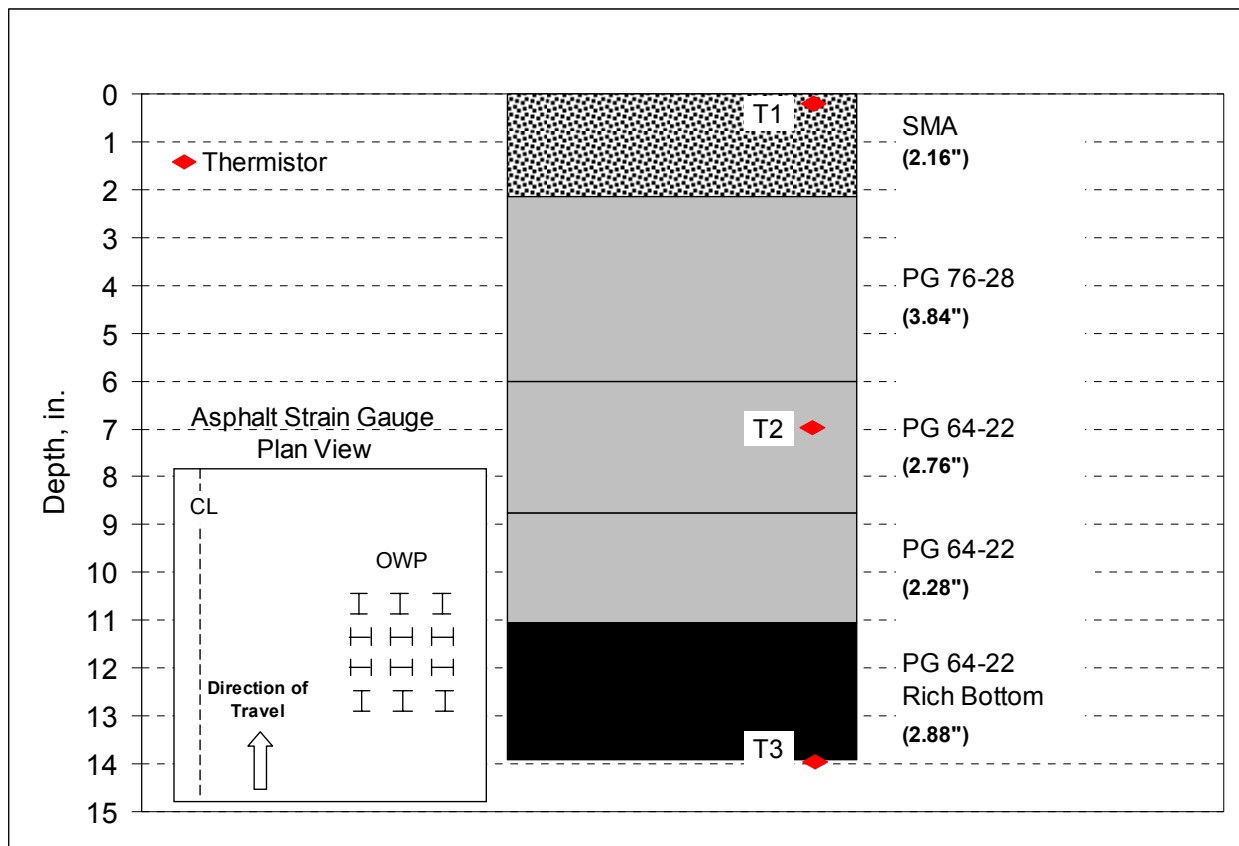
Pavement Cross-Section, Exposing Location of Gauges.
